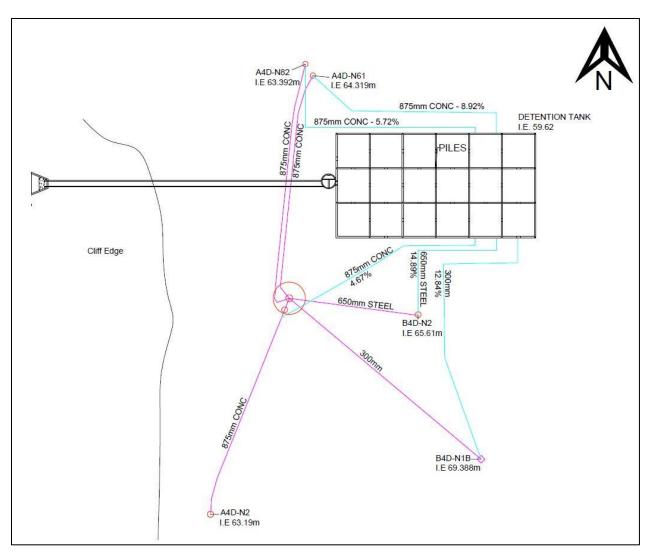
Stormwater Re-routing Diagram(Source: Jas Gill 2017)
